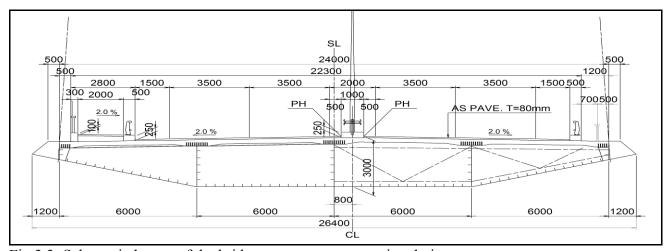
Schematic layout of the bridge structure-cross sectional view
